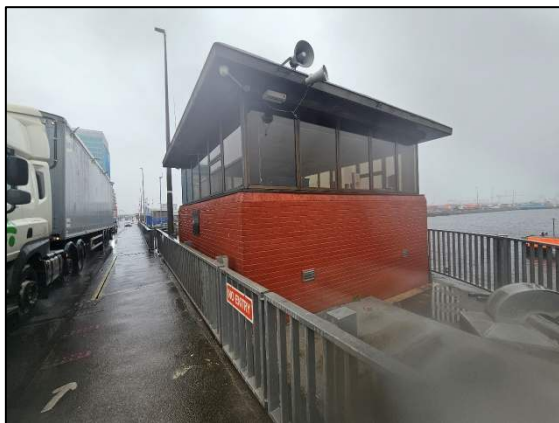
Existing Tom Clarke Bridge Control Tower to be demolished [JM: 30 October 2025].
